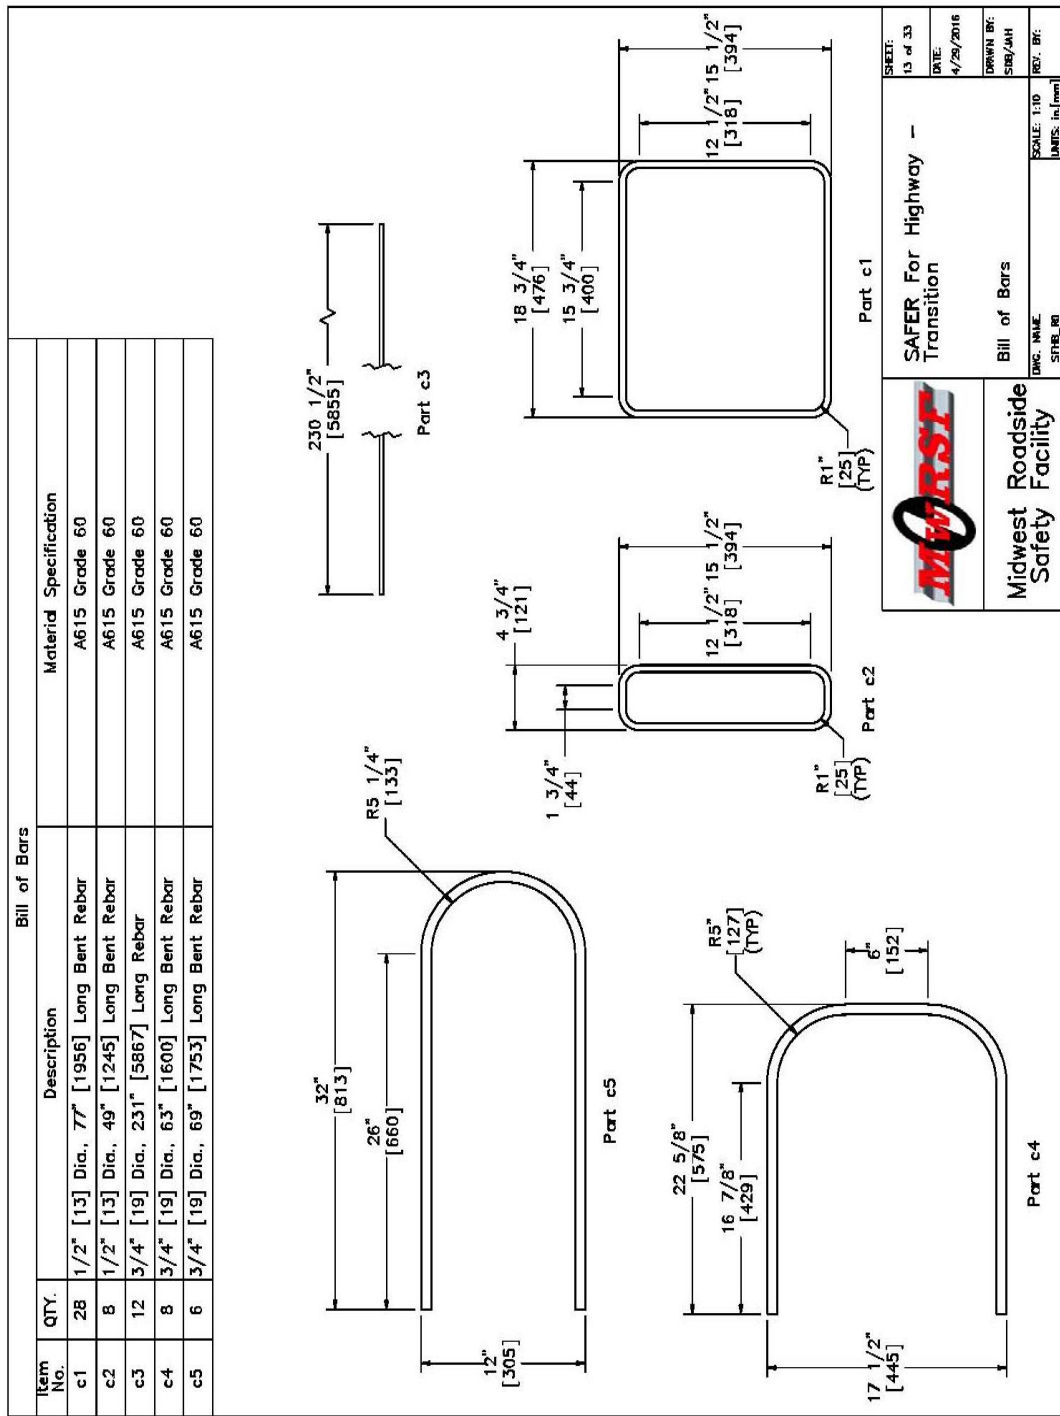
Bill of Bars, RESTORE Barrier Transition
